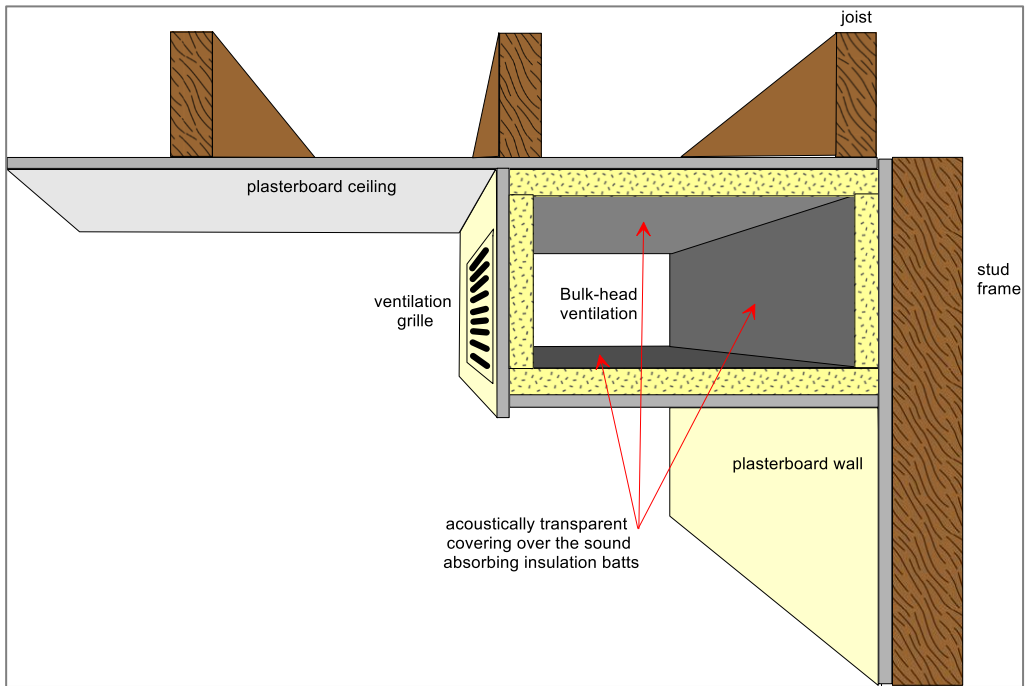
Acoustically lined bulkhead duct for a ceiling/wall fan
